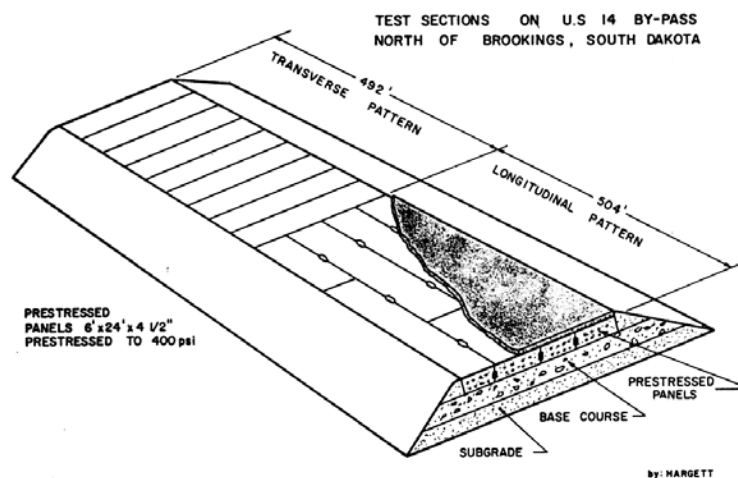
Slab orientation for 1,000 ft test section (Ref 1)
